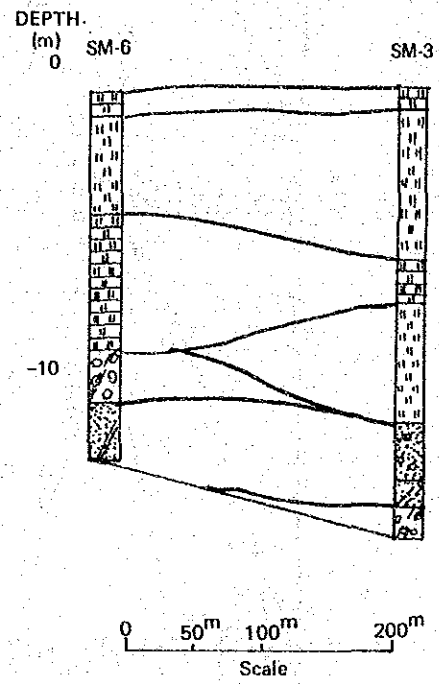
Soil Profile, Section ⑫ - ⑫
